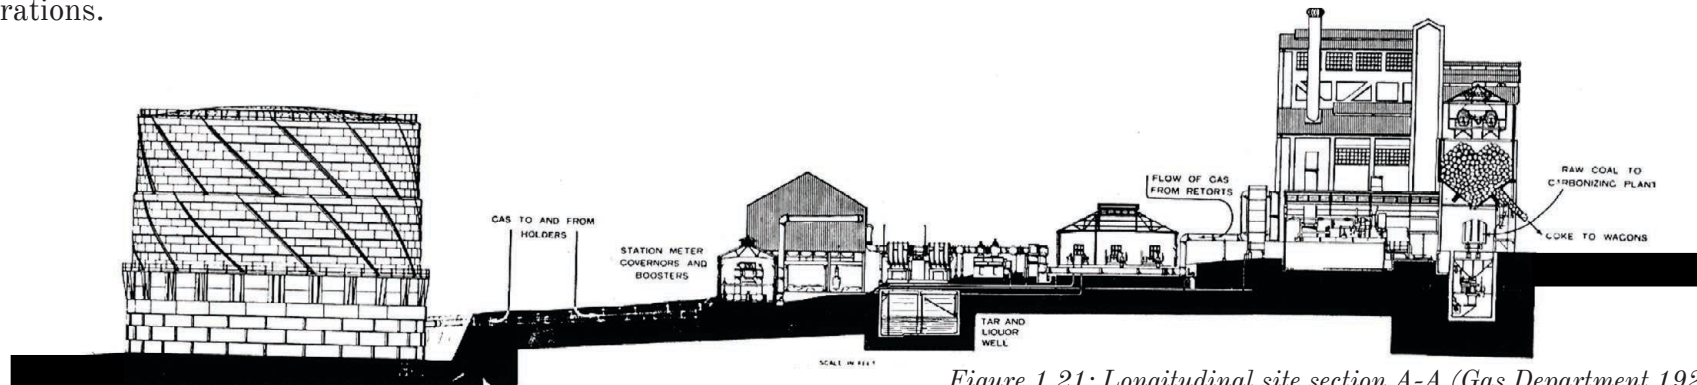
Longitudinal site section A-A (Gas Department 1929)
